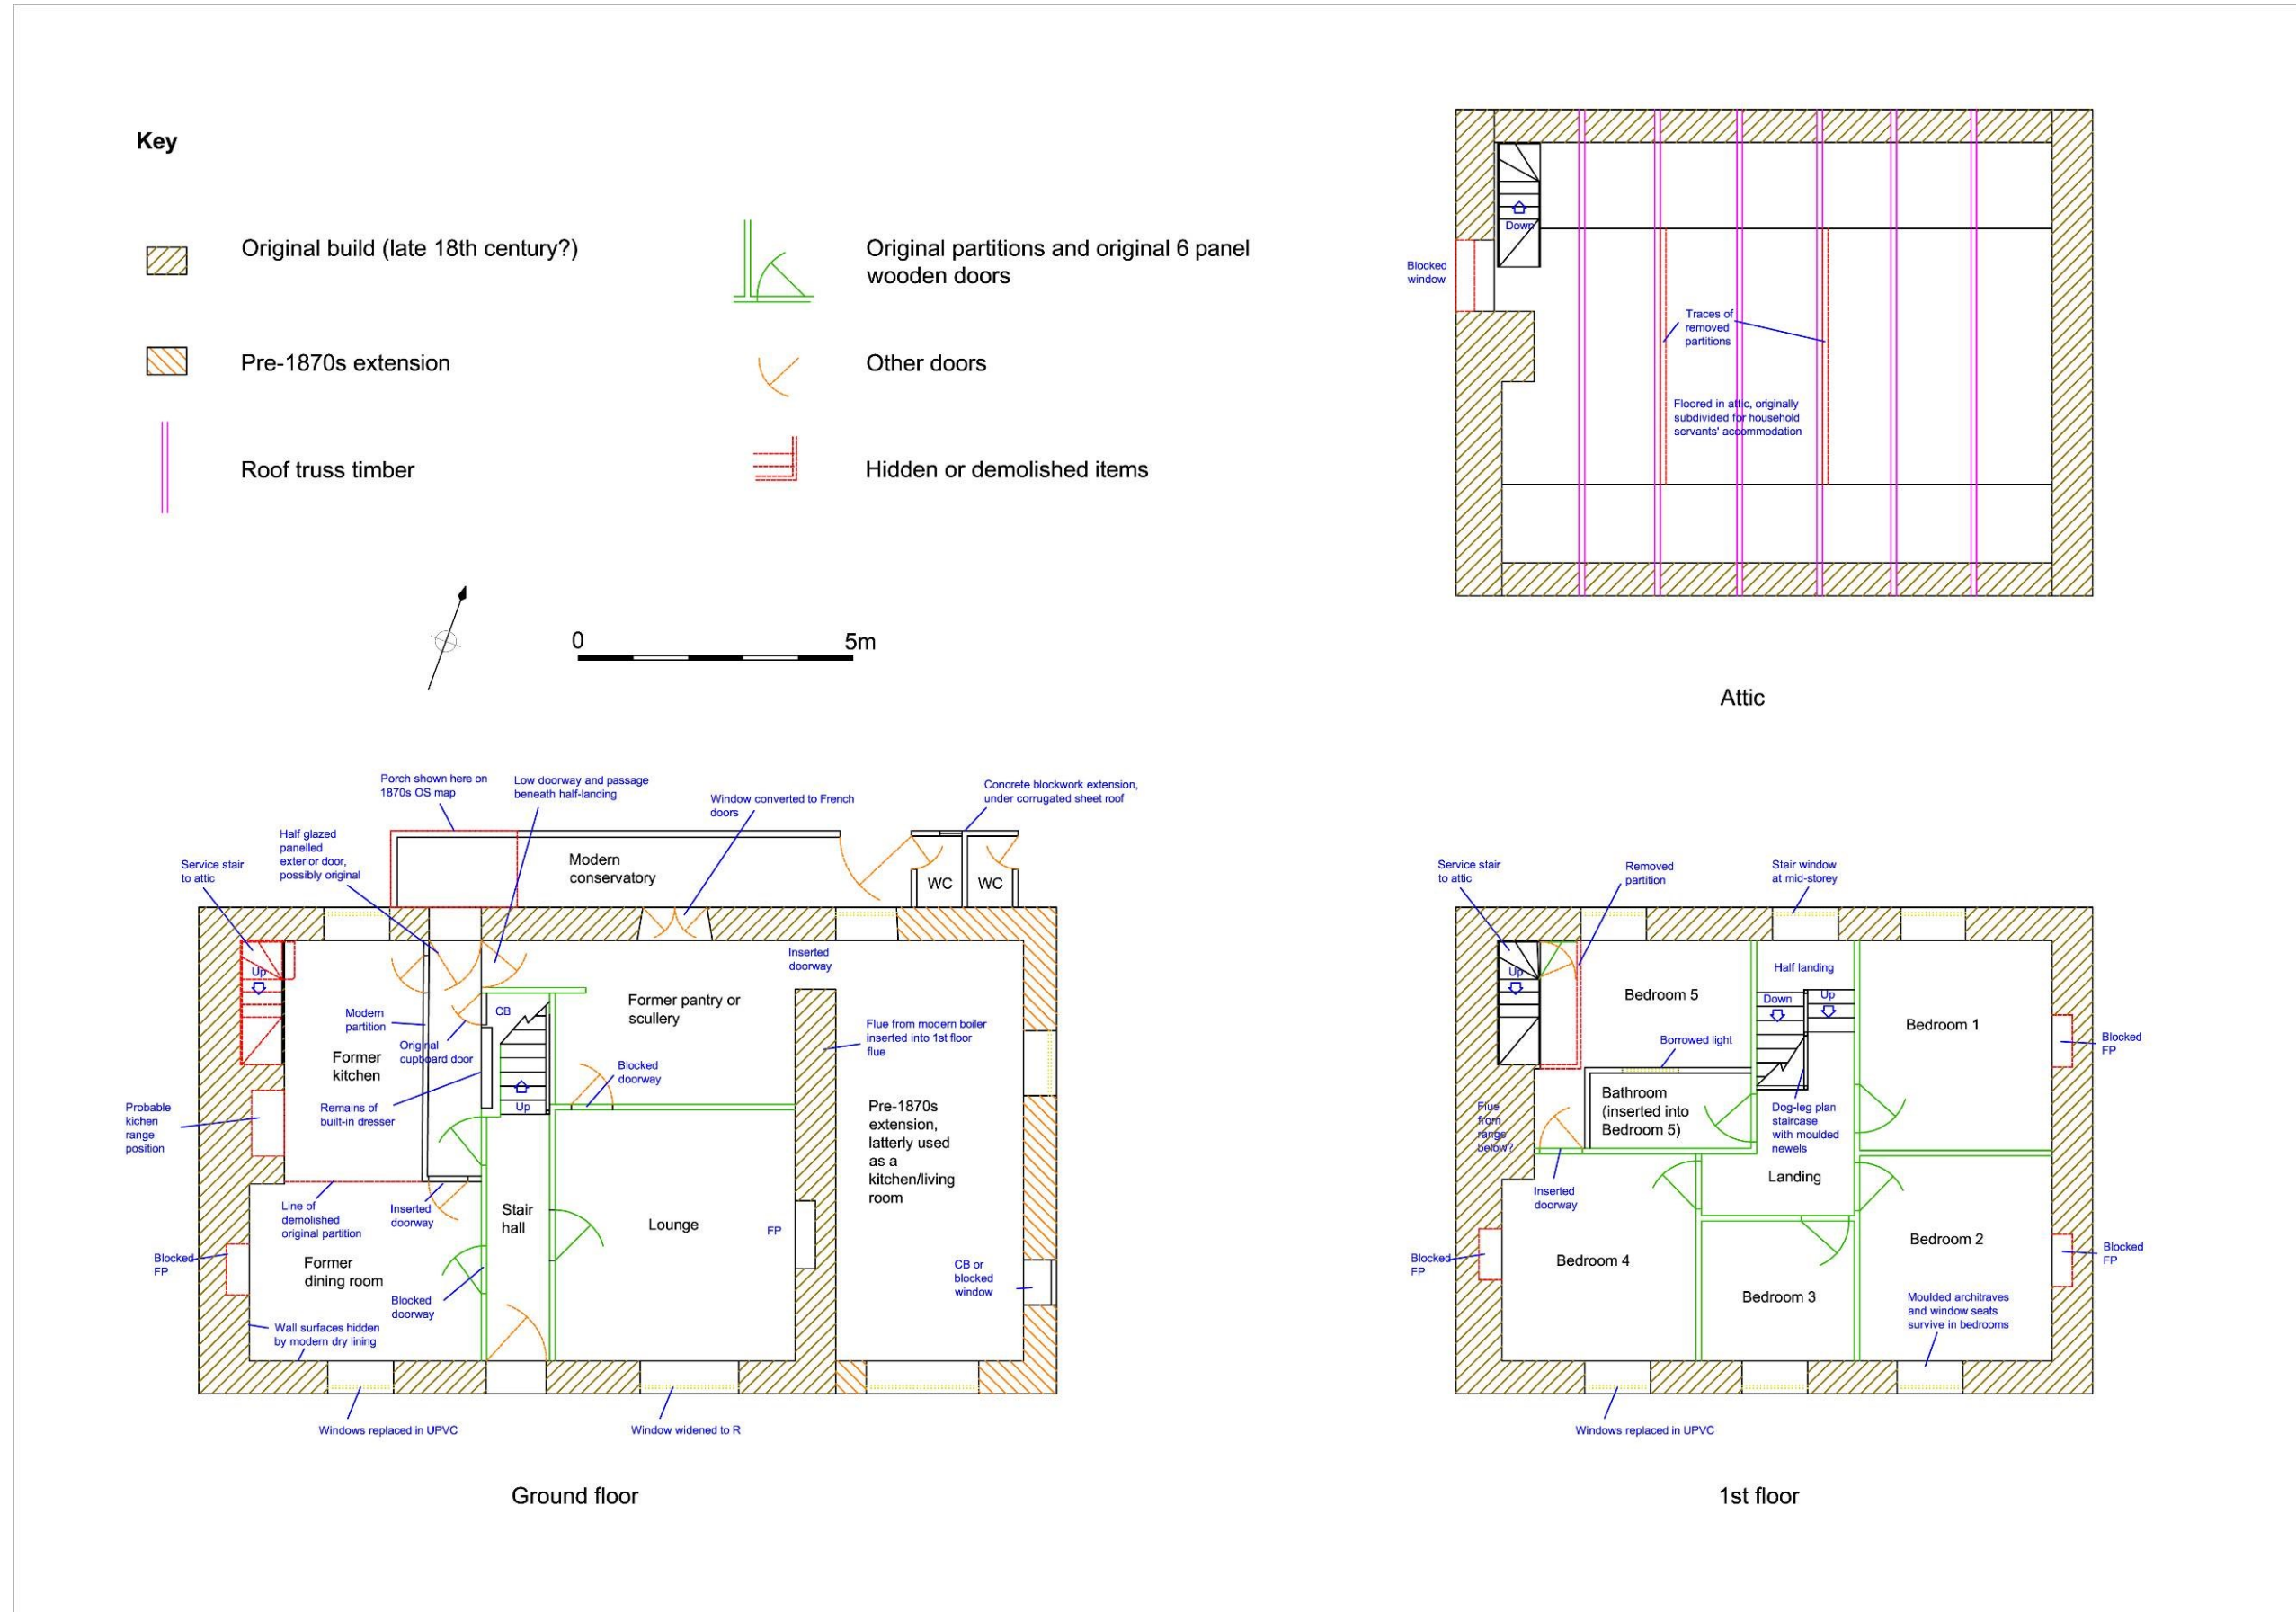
Floor plans of Sylmar cottage, Penhellick.
